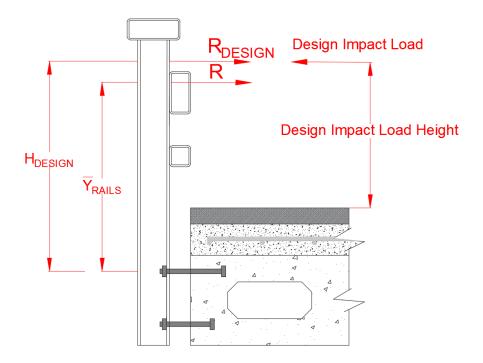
Lateral Resistance of Bridge Railing System at Height of Design Impact Load
